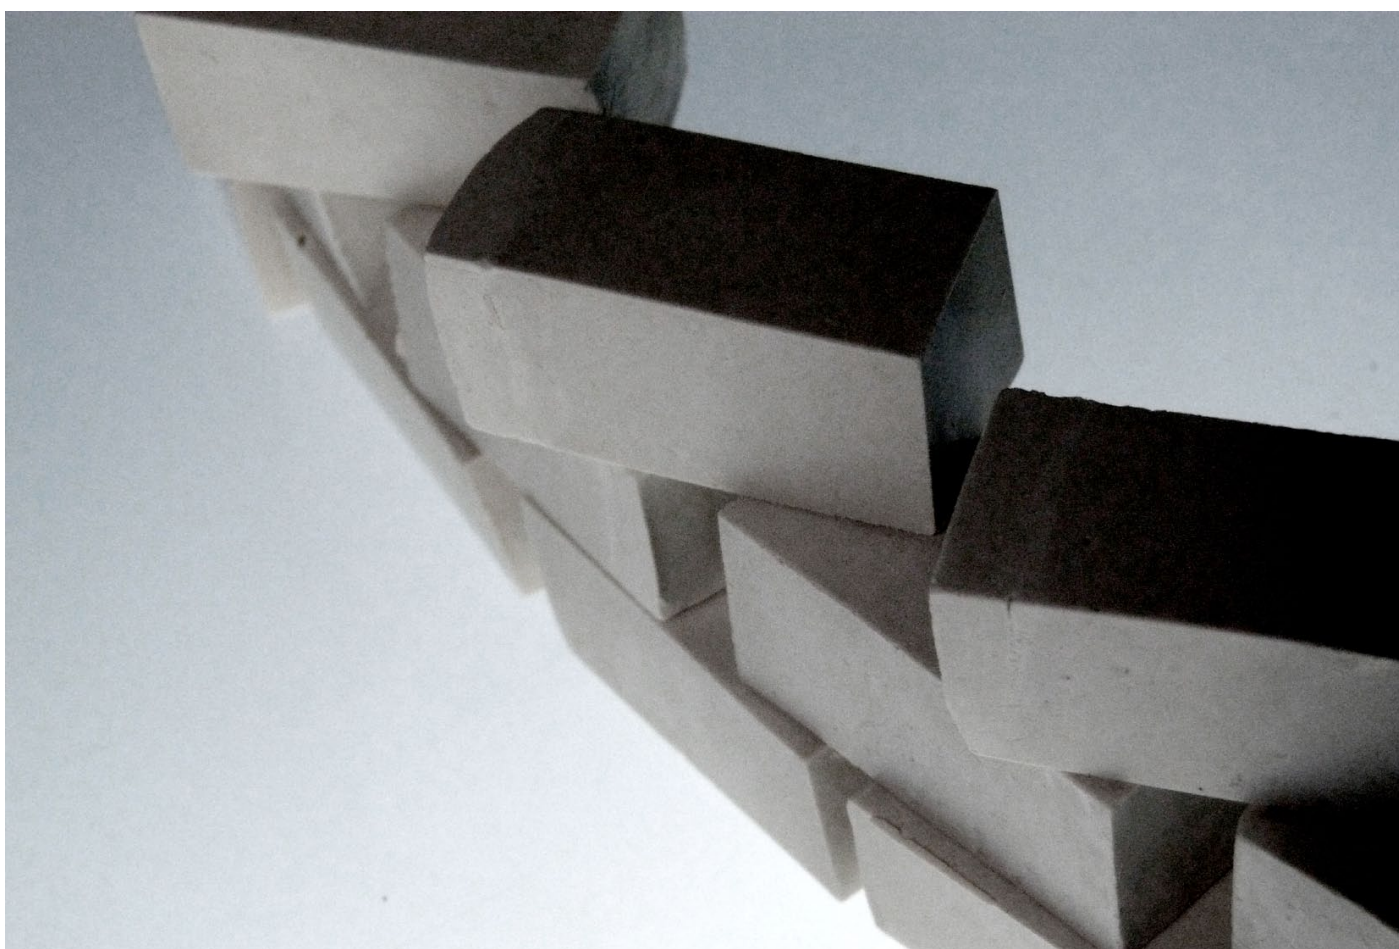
'Analogue' bricks testing spacing and shadow
